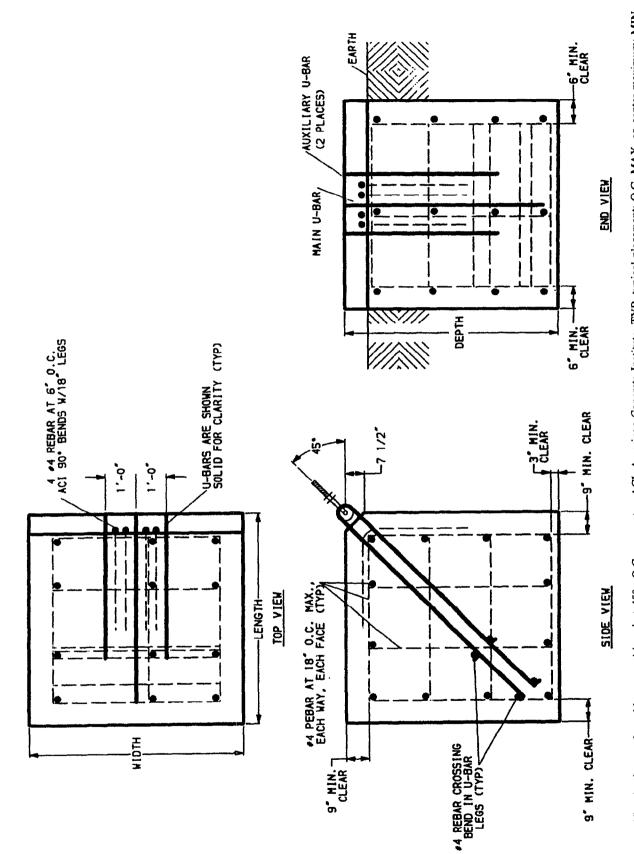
Anchorage for cableway positioned at 30°. O.C., on center; ACI, American Concrete Institute; TYP, typical placement; O.C. MAX, on center maximum; MIN. CLEAR (TYP), minimum clearance (typical placement).
